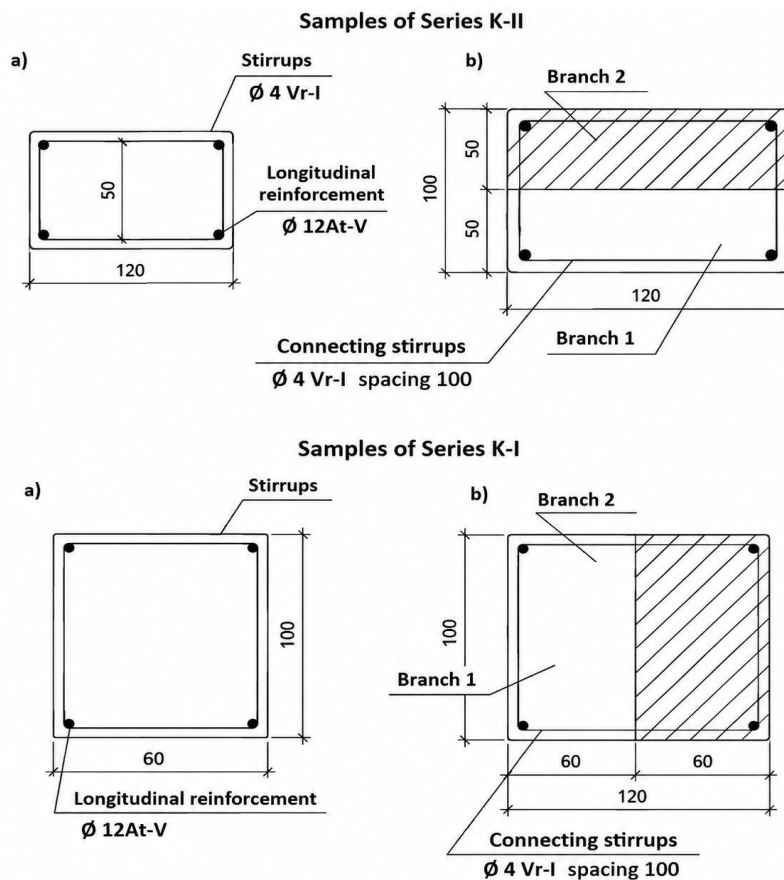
Experimental reinforced concrete specimens: (a) Branch 1, representing the pre-existing (precast) concrete; (b) specimens after joining Branch 1 (earlier concrete) and Branch 2 (later concrete)]
